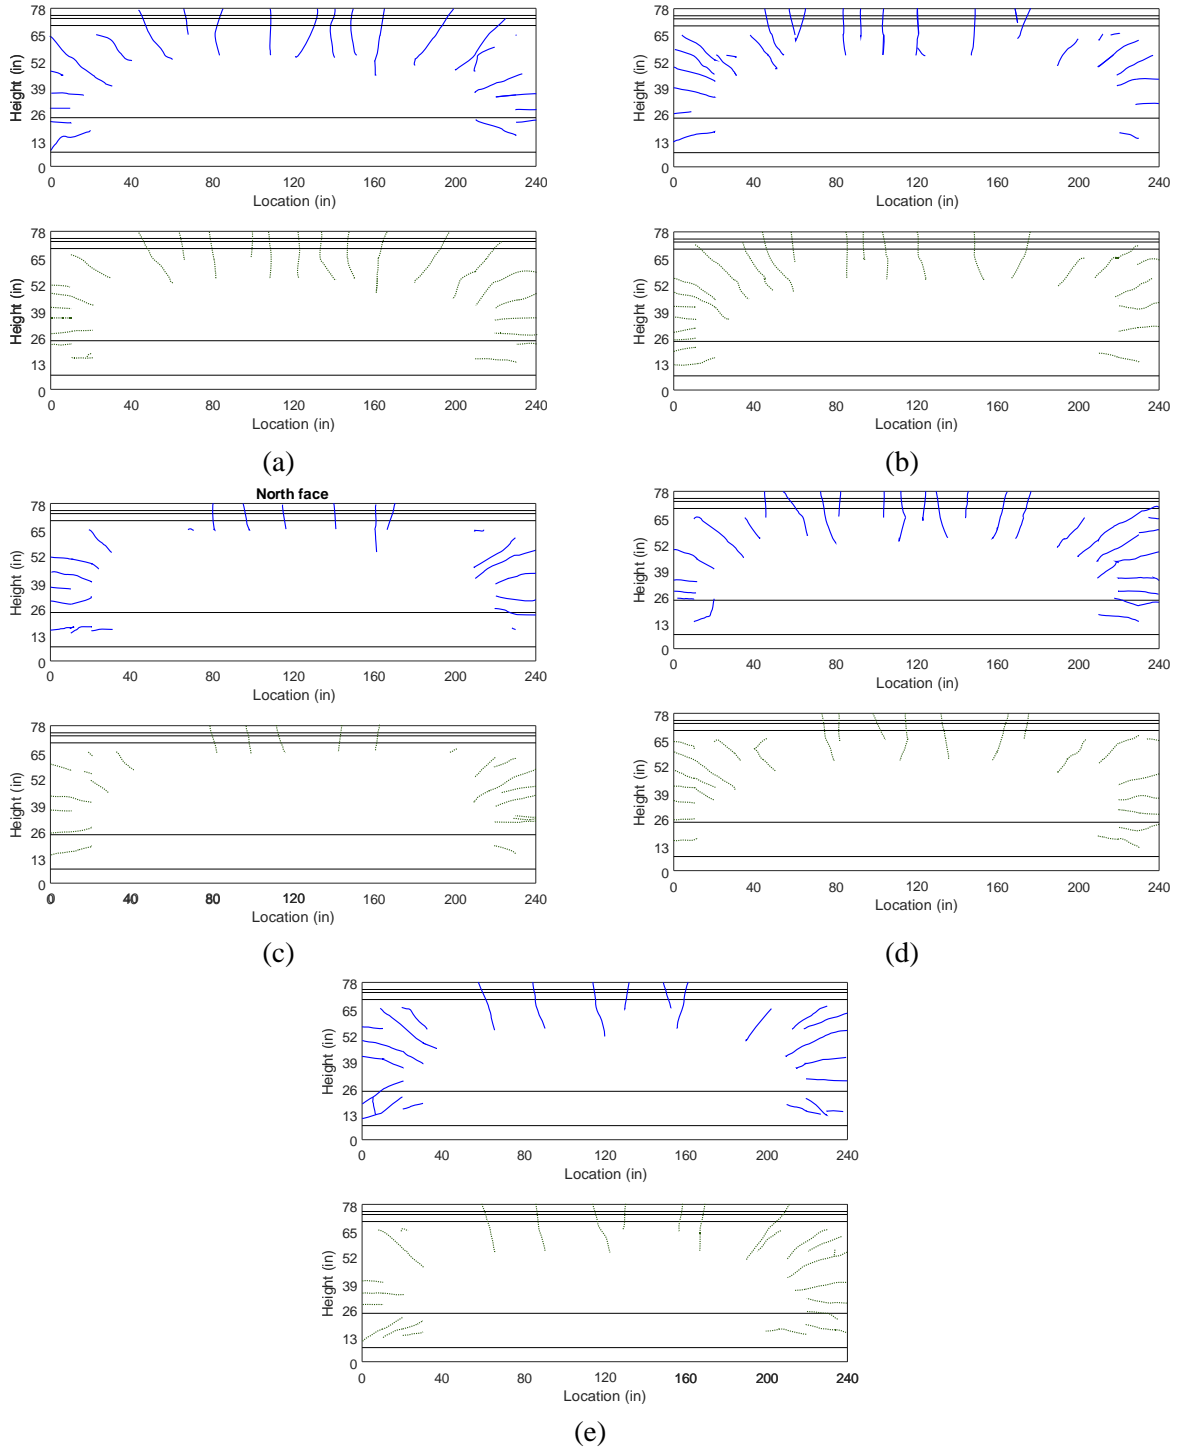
End region cracking at 148 days shown on north elevations of specimen: (a) CT, (b) SH-30, (c) SH-70, (d) CR-70 and (e) PP-50. Solid blue lines depict cracks visible on the North face and dashed green lines depict cracks visible on the South face. Origin at conventional detailing.
